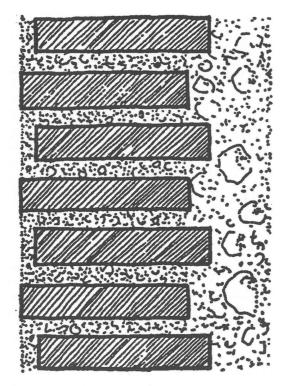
Curtain wall with recessed brick wall. (C. Latina 1994)
